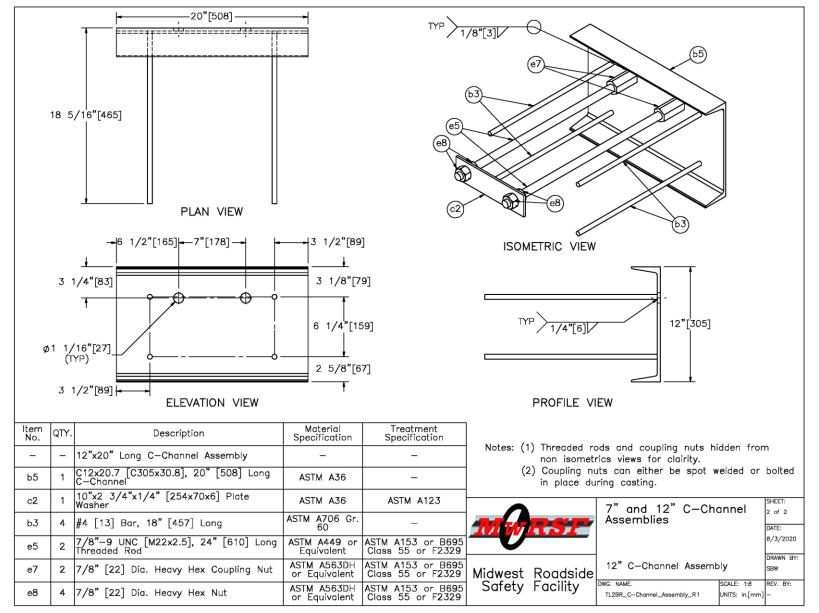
Details for 20-in. Long C12x20.7 Channel Assembly for Use on 12-in. CIP decks
